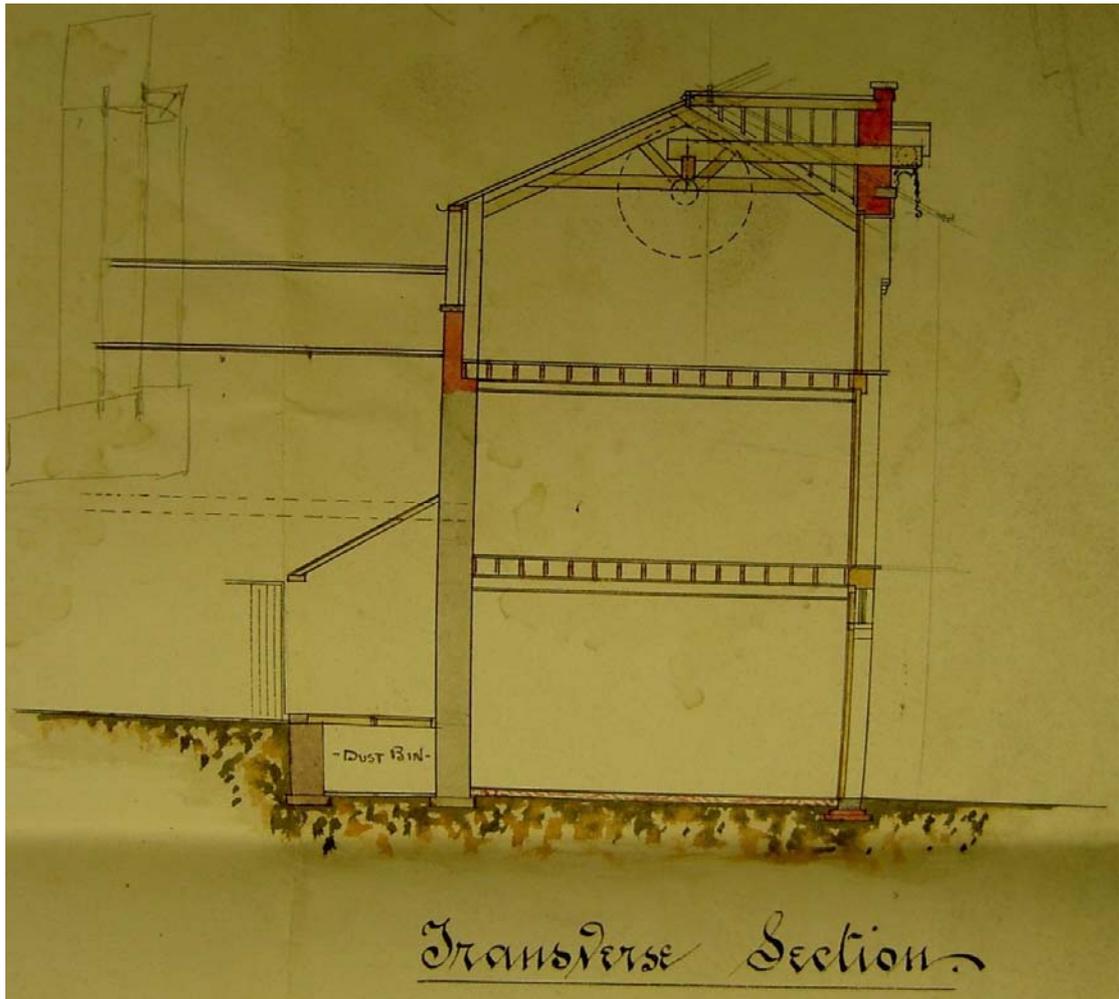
Transverse section of proposed warehouse (CRO(B) Z1392 1877)
